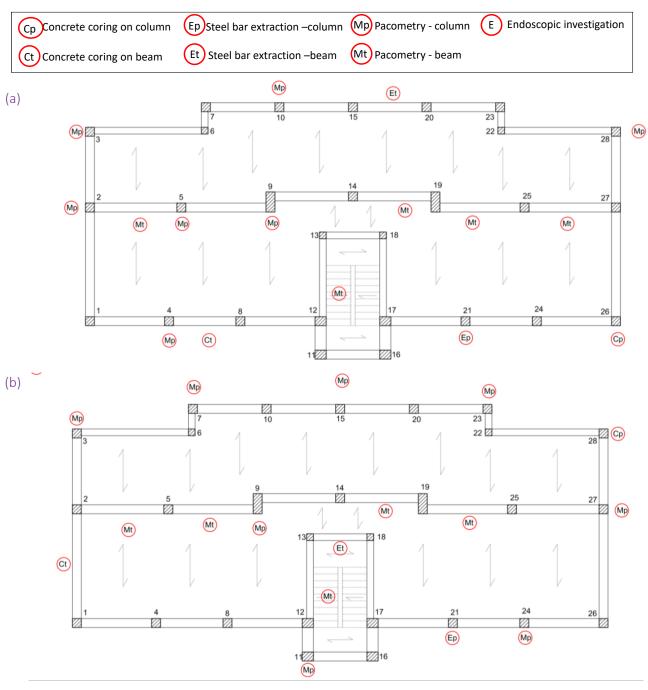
Survey plan – (a) Third Floor, (b) Fourth floor.
